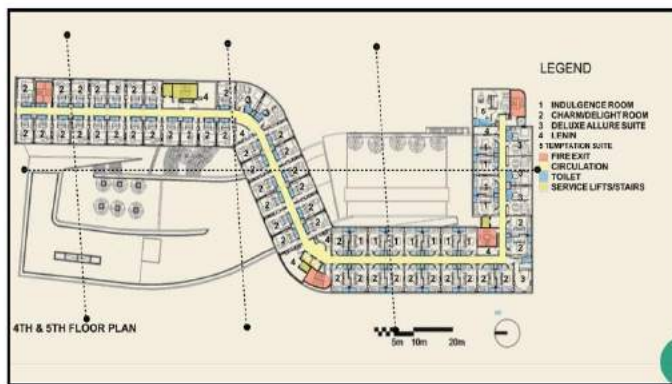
TH AND FIFTH FLOOR PLAN
